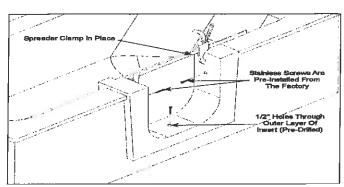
Screwing Door Kit Insert To Filler Pieces
